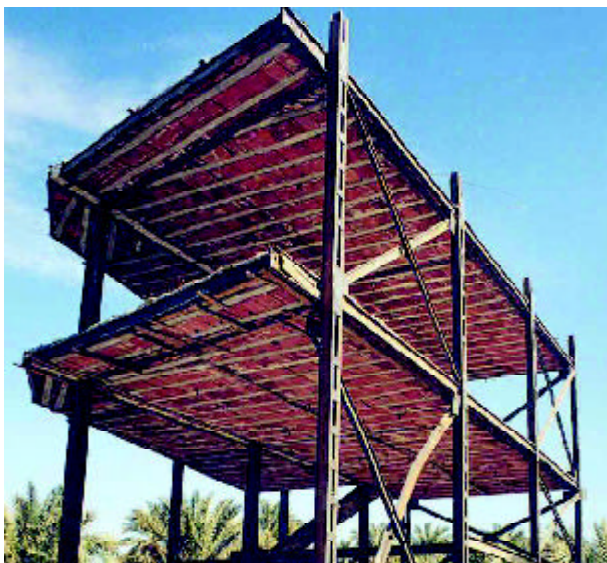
Good seismic performance of well-constructed concrete beam-hollow block slabs.
